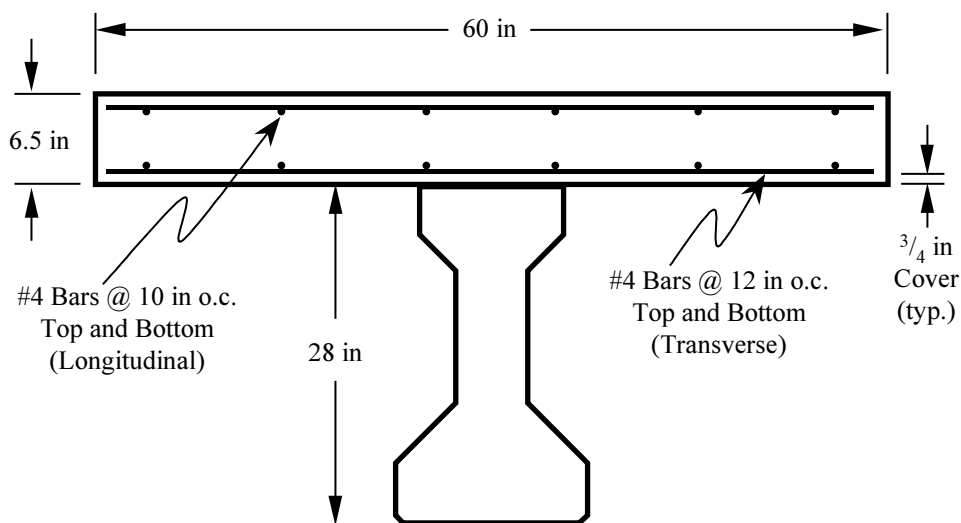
Dimensions and Reinforcement of Cast-in-Place Composite Deck (1 in = 25.4 mm)
